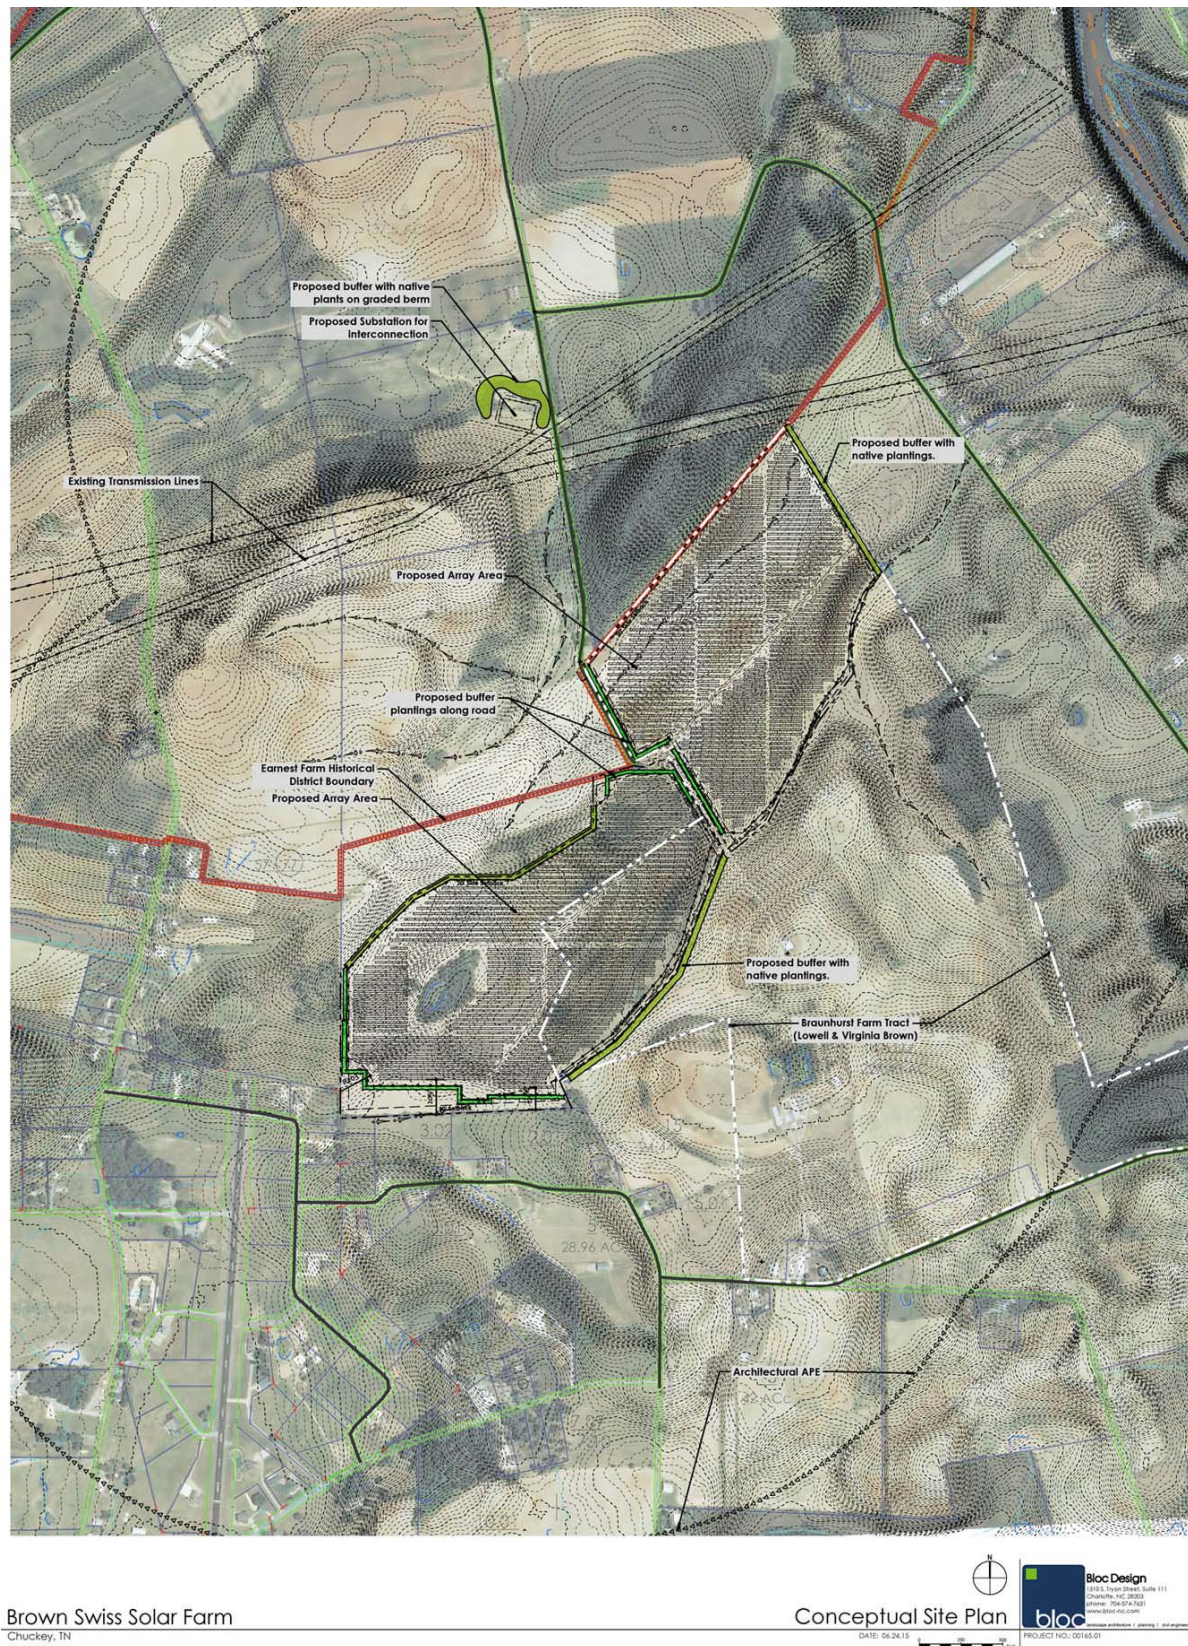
Conceptual site plan for Brown Swiss solar facilities.
